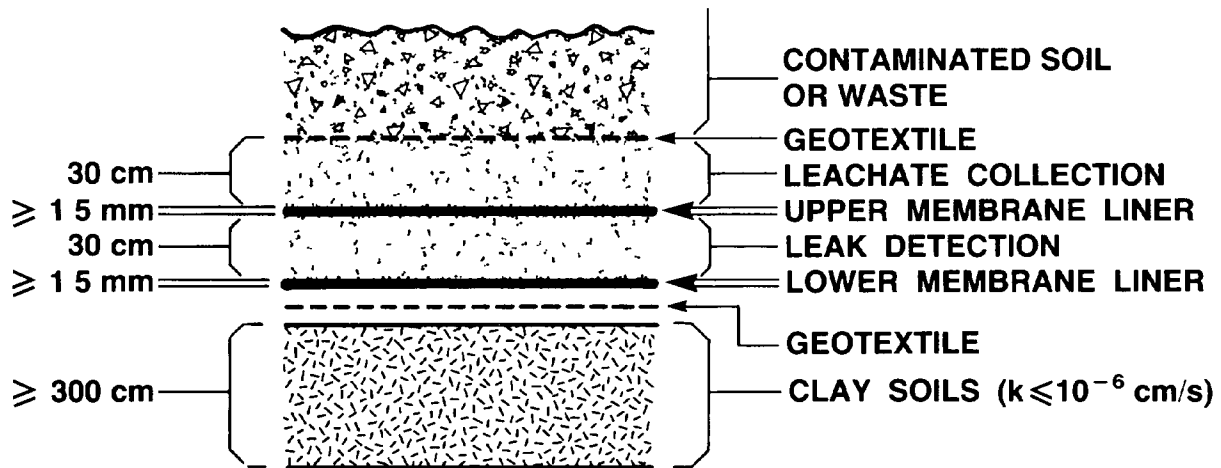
Cross-section of Cell Bottom in Impermeable Hazardous Waste Cell (Maximum Security Type, LaSalle, Quebec)
